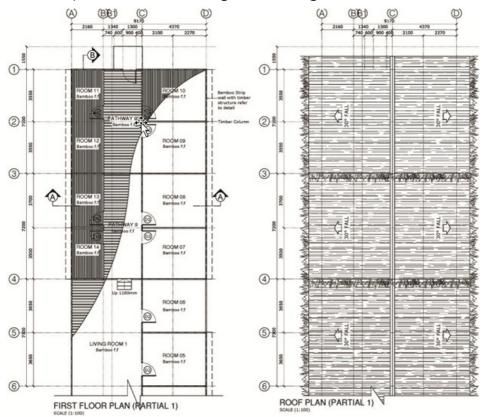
Typical floor plan, partial floor plan of the Maranjak longhouse Source: Personal
